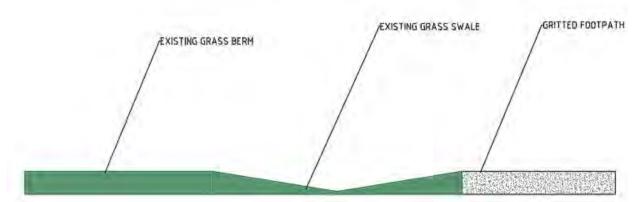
Existing cross-section, with the addition of a gritted footpath.
